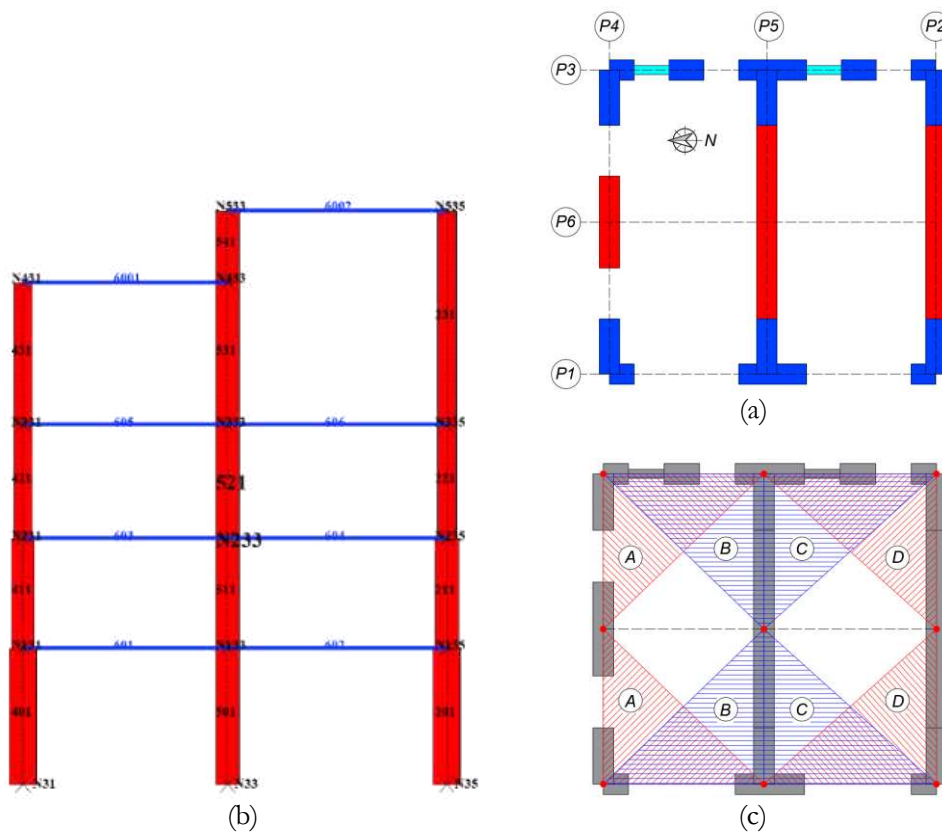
Out-of-plane modeling: (a) plan view with piers of fictitious wall P6 in red; (b) fictitious frame for wall P6; (c) triangular membranes.
